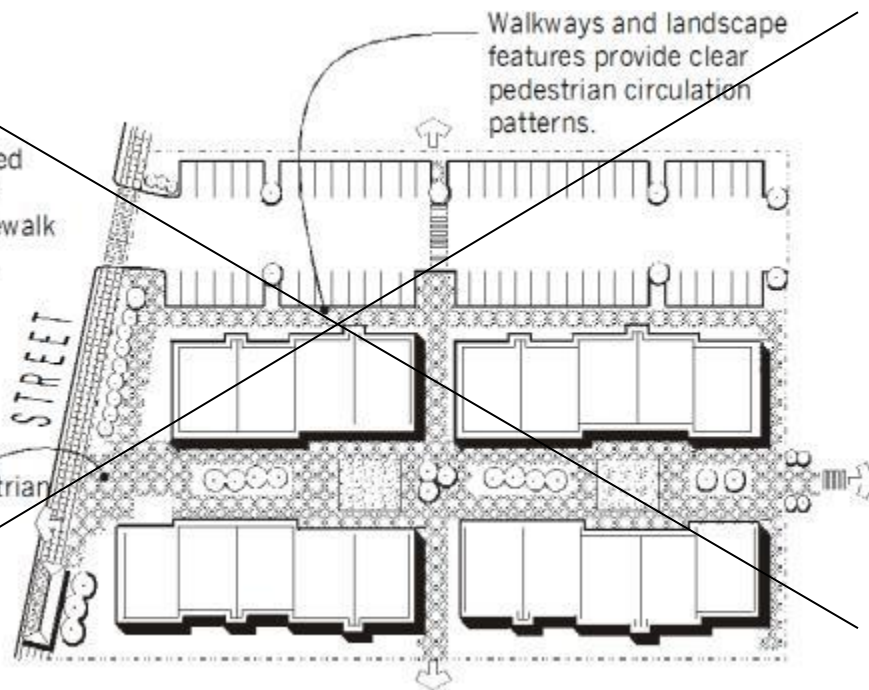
(D): Avoid parking that dominates the site. Encourage parking located behind or on the side of buildings and common open space between buildings.
